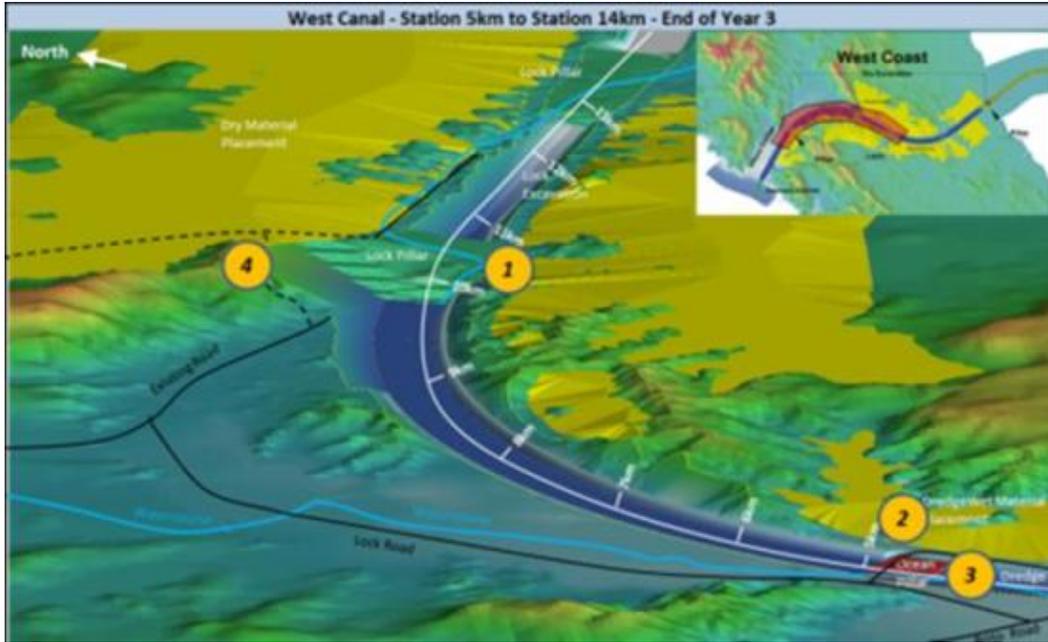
Year 3 West Canal Activities between Stations 5 and 14 Kilometers
